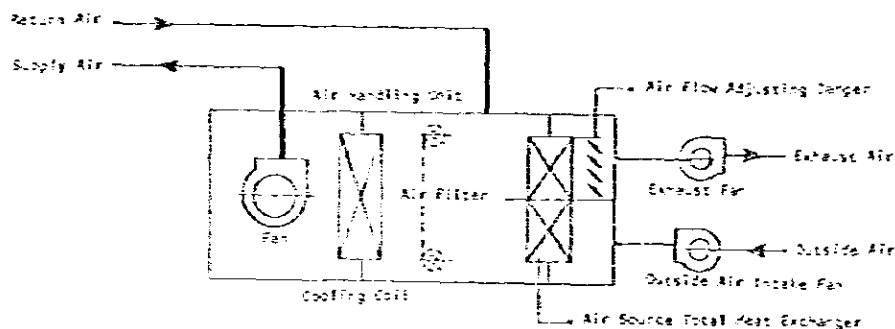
AIR HANDLING UNIT AIR DIAGRAM
